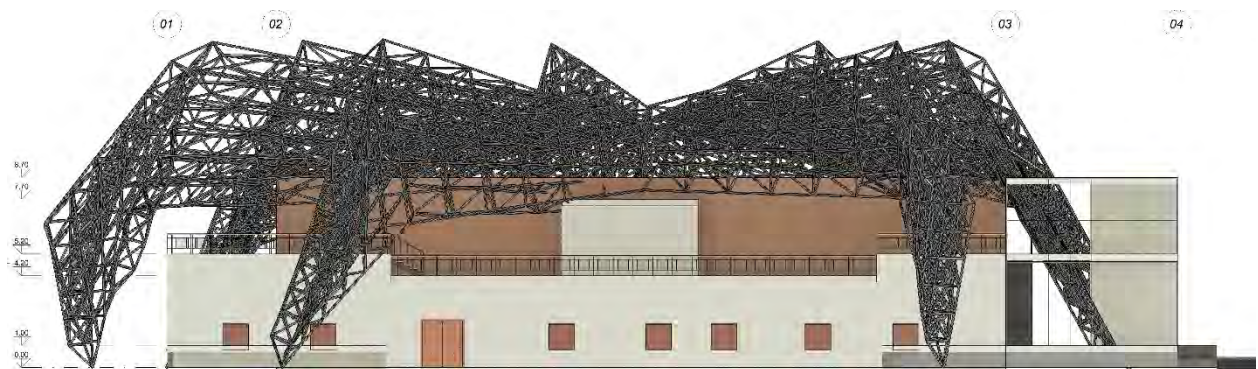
West elevation -open to the volcano-, realistic view (own image from Revit).
